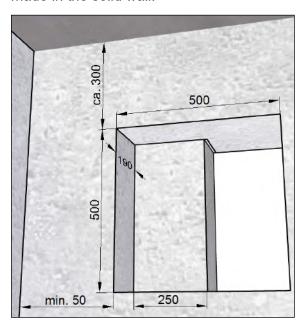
Wall breakthrough for installation kit without filler piece, dimensions in millimetres
